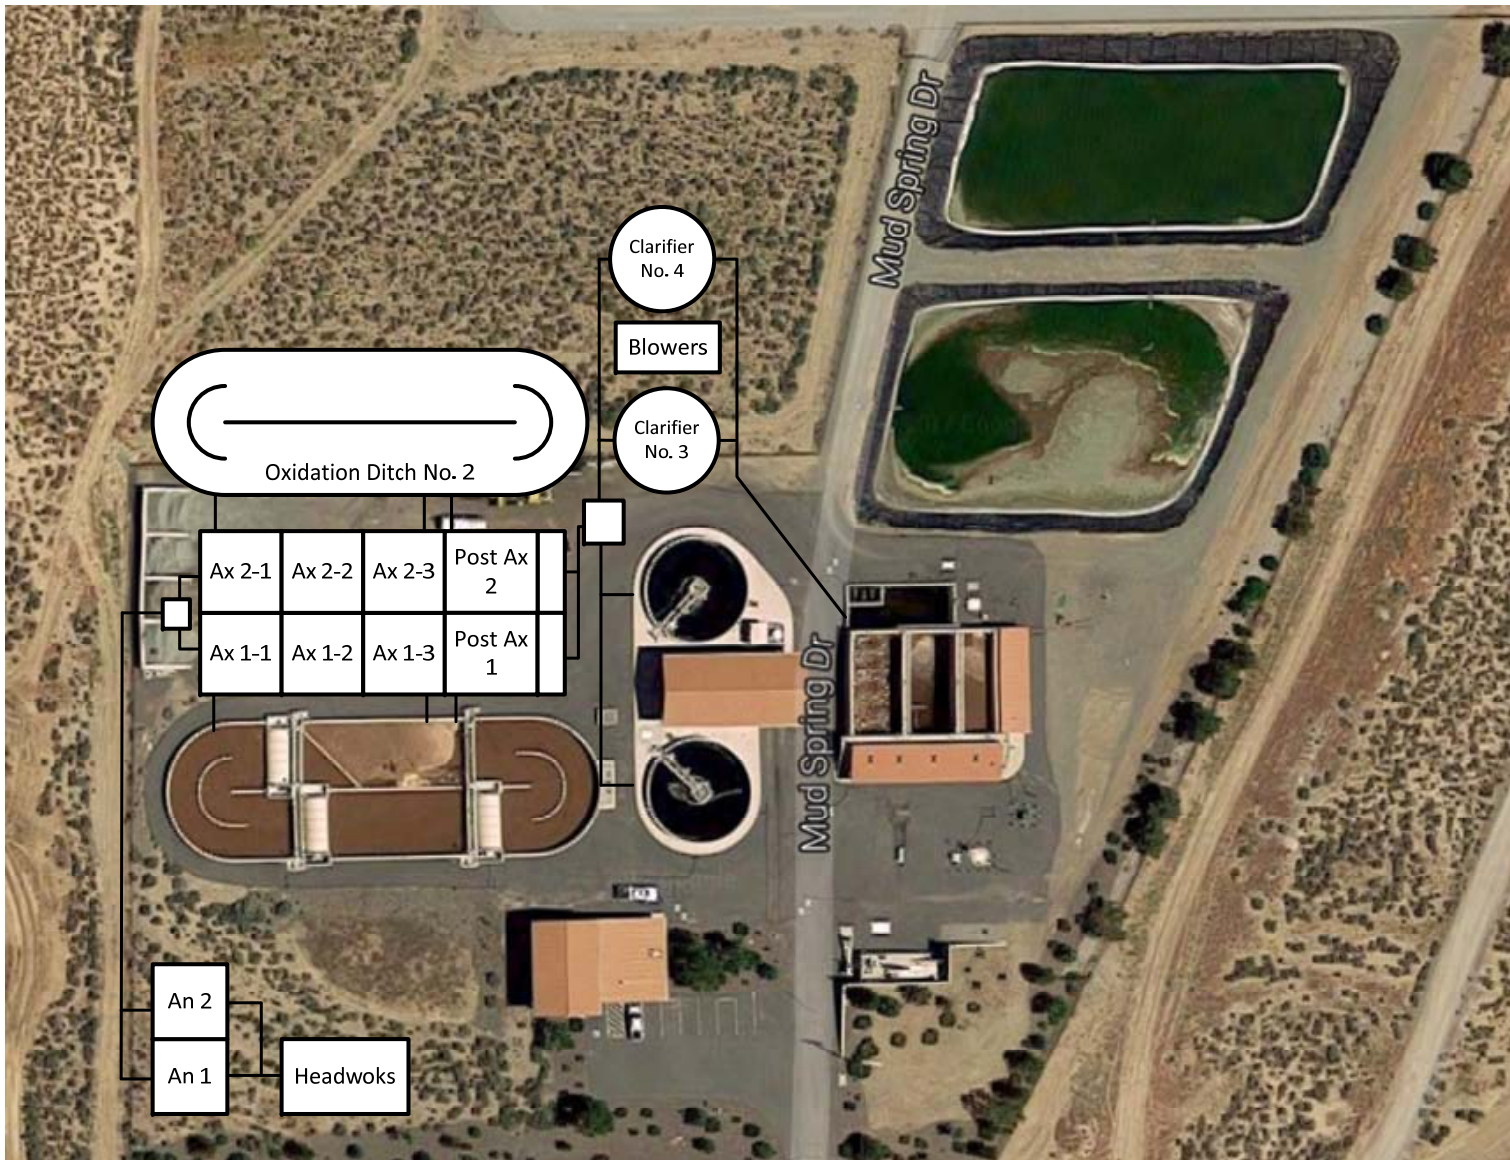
Option 3 – Five Stage Bardenpho - Site Layout with Headworks
